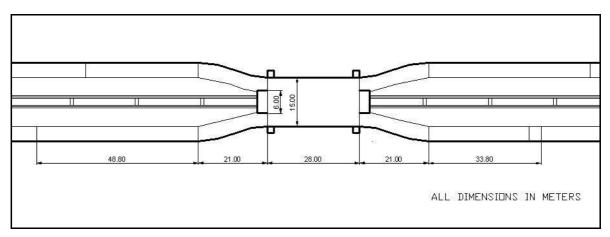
Top View On/off Switch Cover Dimensions
